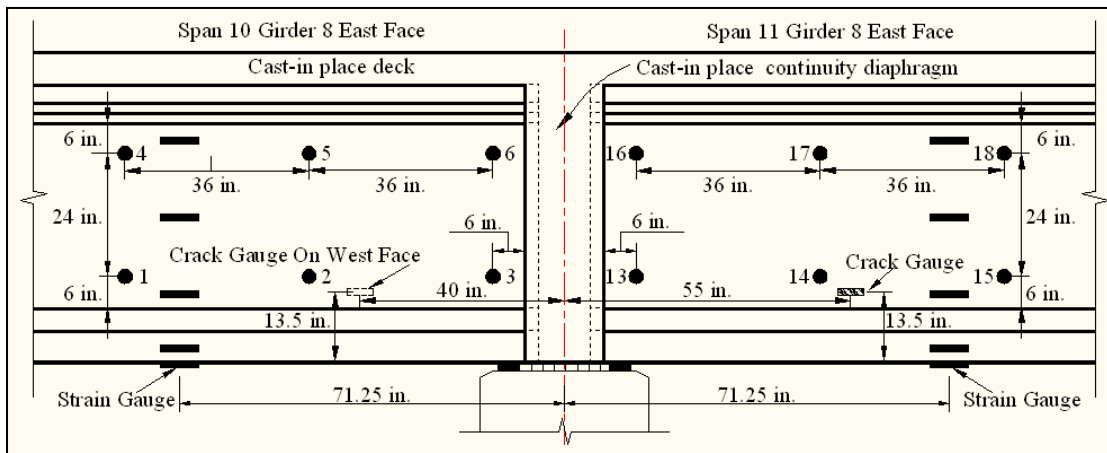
Sensor configuration on east face of Girder 8 (Xu 2008)
